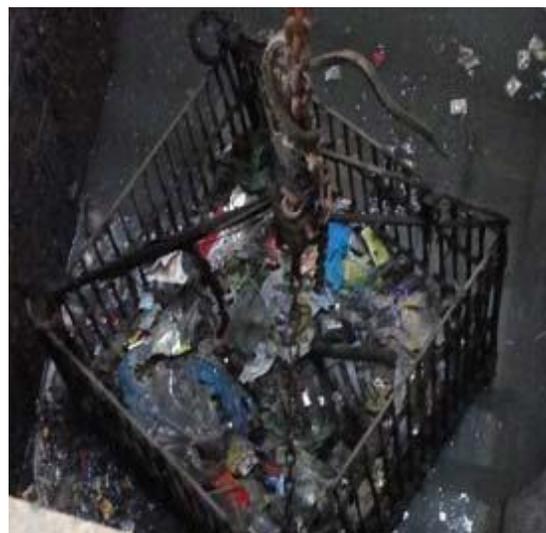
Pictorial Views of Wastewater Infrastructure Condition
